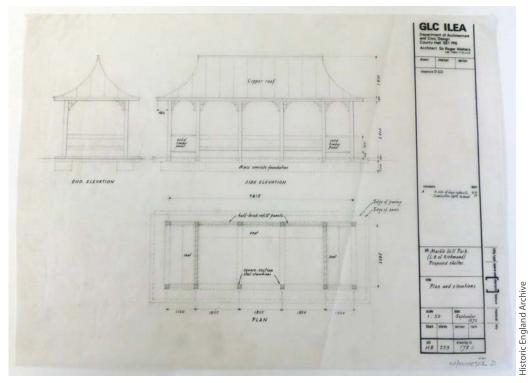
GLC drawing for a new shelter with copper roof, 1972
